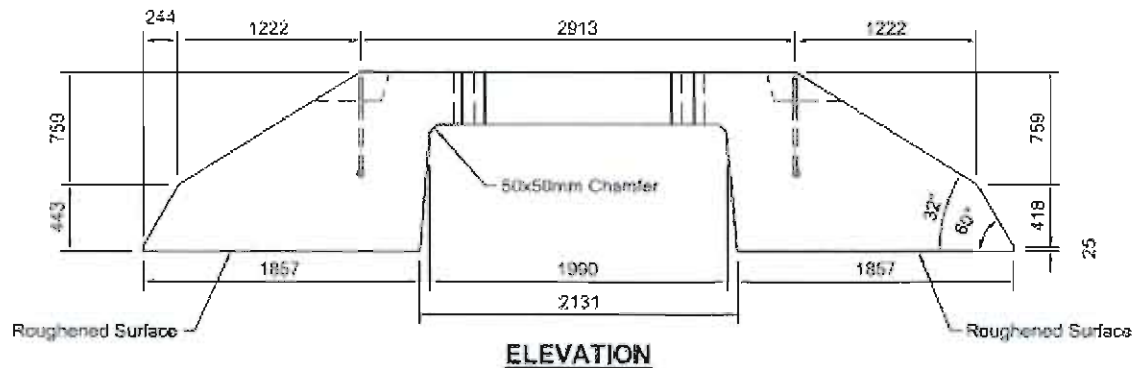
Cross-Section of Concrete Protection Tunnel
